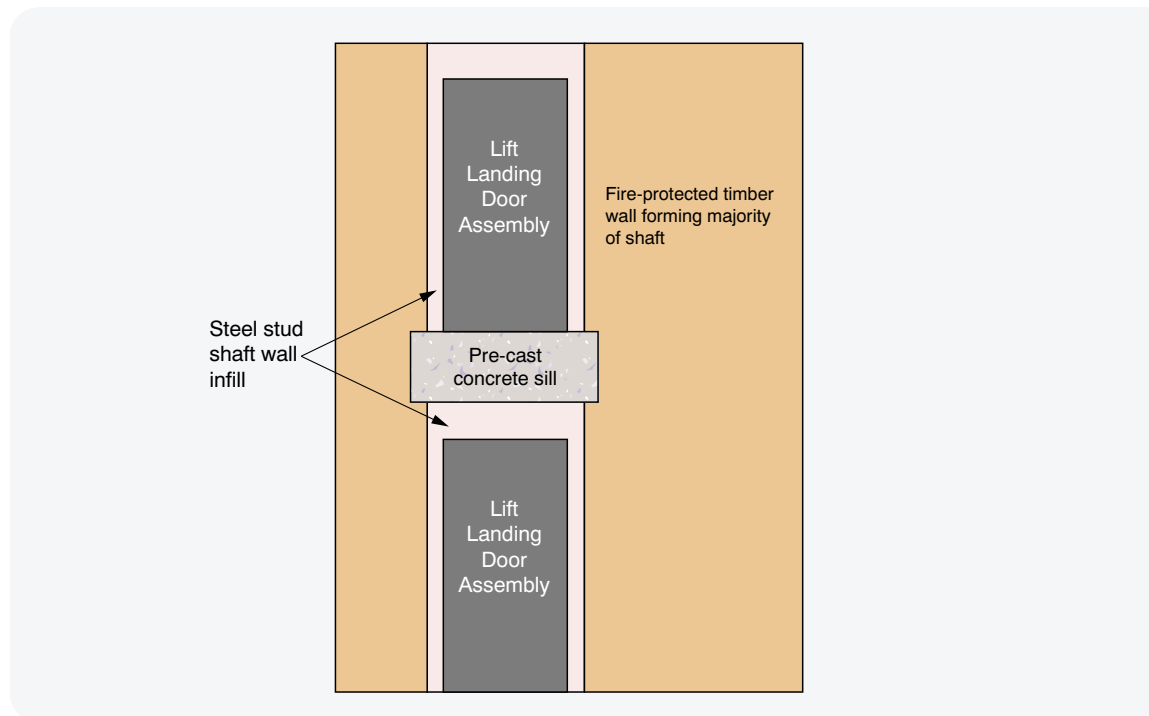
(19): Elevation showing wall transition around lift landing doors.
